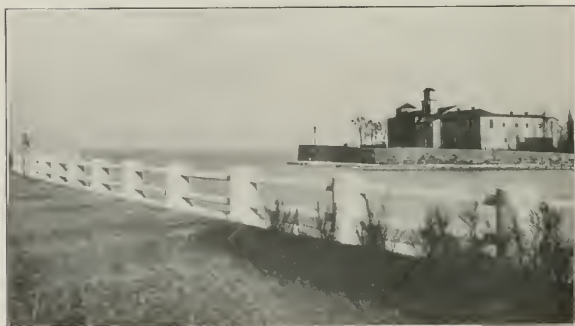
CONCRETE RAILING AROUND ENTRANCE TO JACKSON PARK
